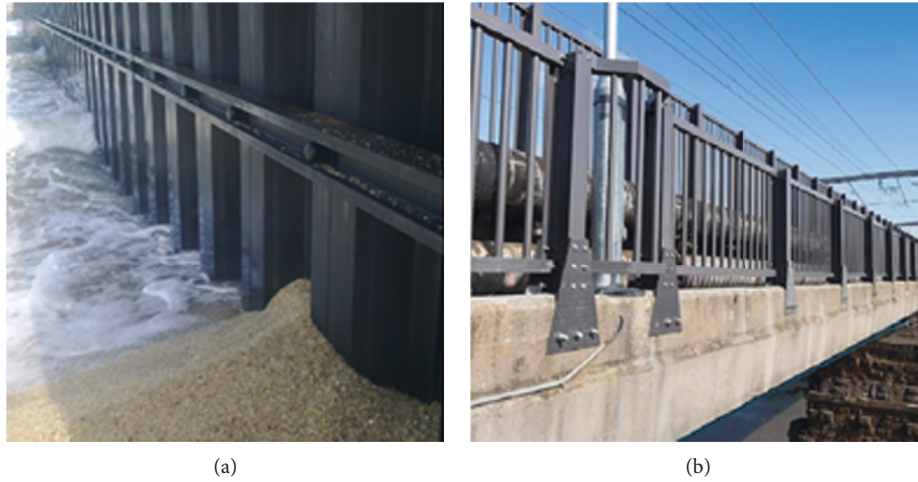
Pultruded retaining wall in Azerbaijan (a) and pultruded railway bridge barriers in England (b) [9, 10].
